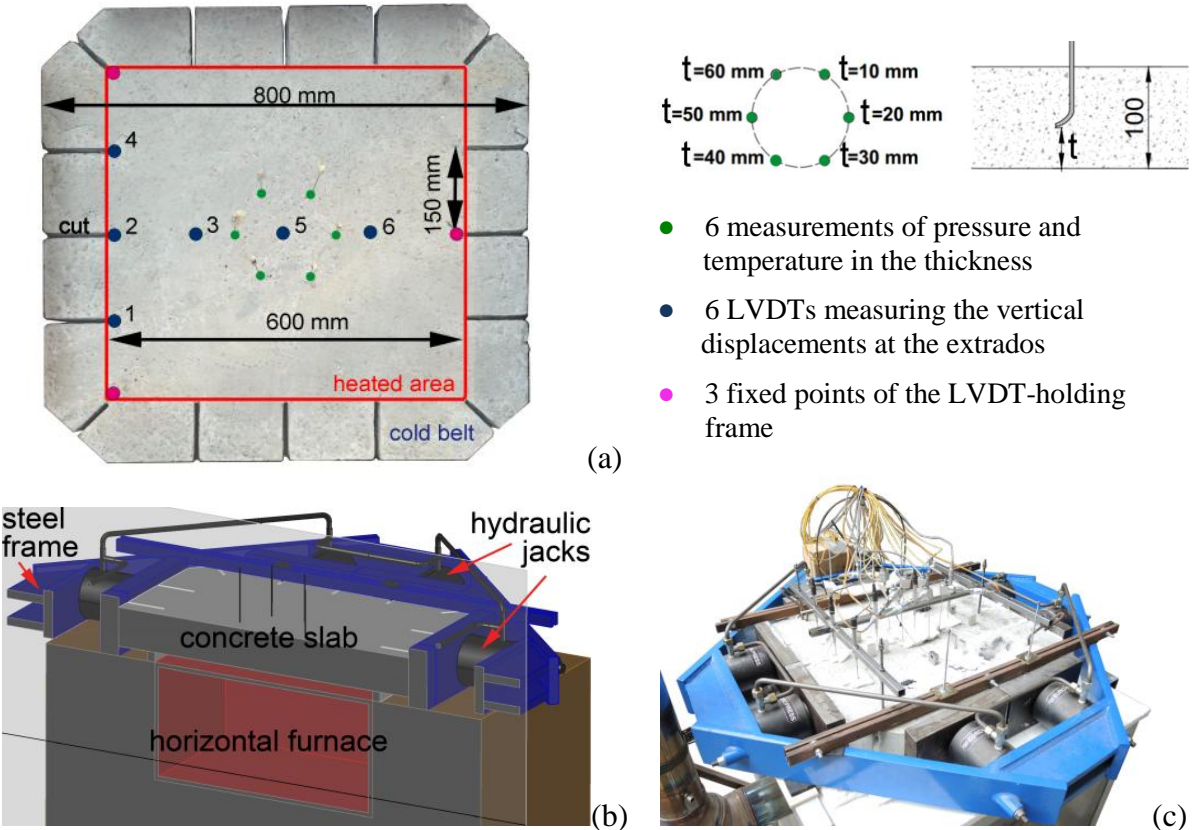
(a) Concrete slab and measurement points; (b) concrete slab within the loading system (steel frame + hydraulic jacks) positioned on the horizontal furnace; and (c) picture of the instrumented slab, ready for the test.
